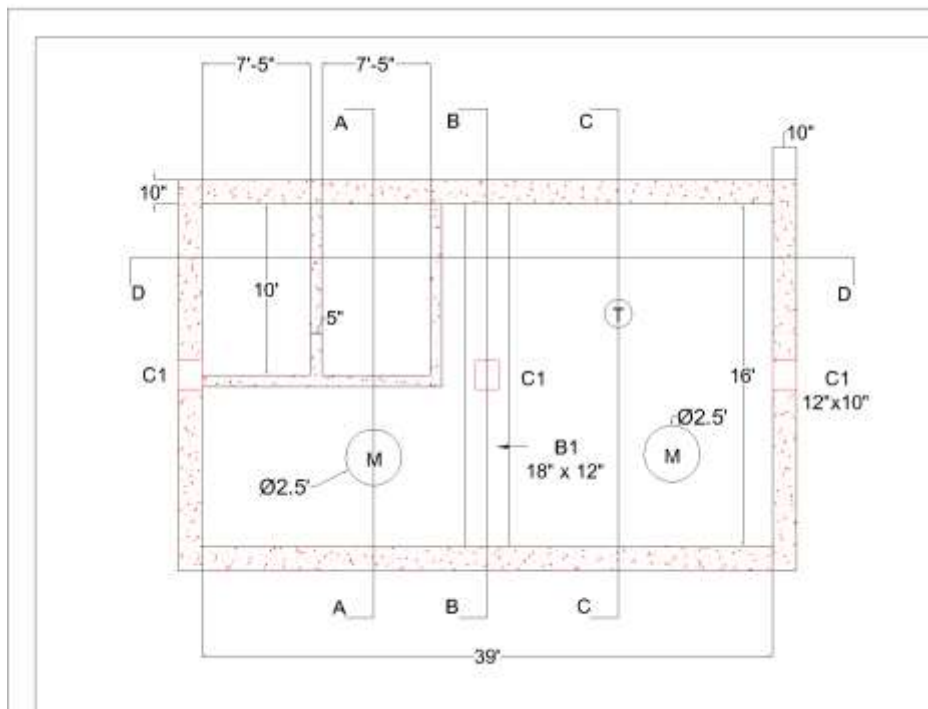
Storage tank plan for very large Institution-scale tank for 100 households
